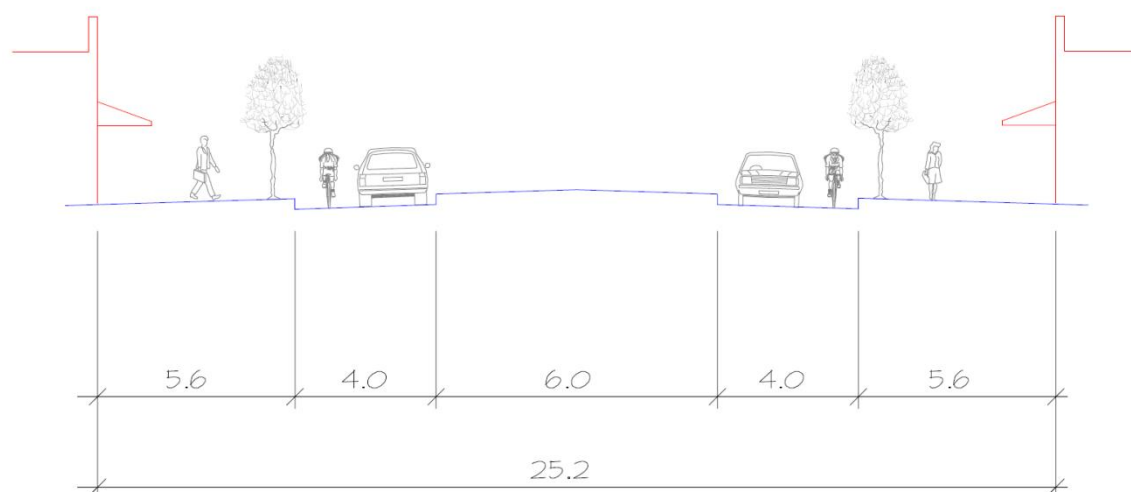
Proposed Cross Section for the Main North-South Spine Road
